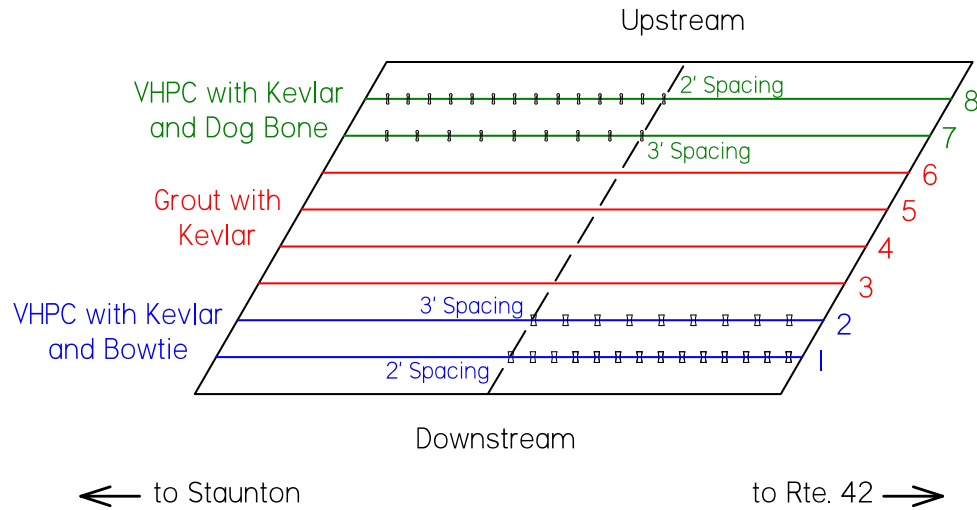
Buffalo Branch Bridge Rehabilitation Plan
